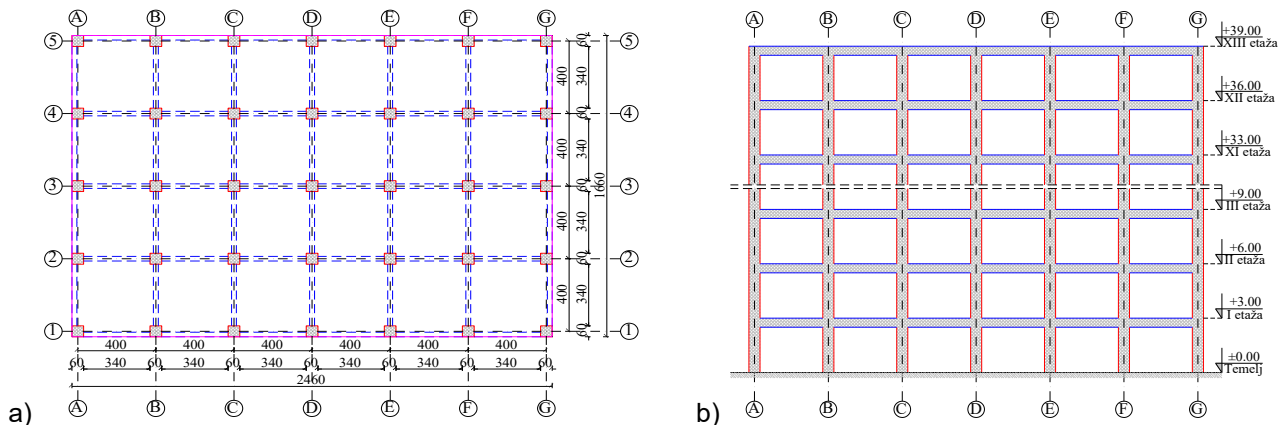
Disposition of the analysed structure; a) floor plan, b) longitudinal section
